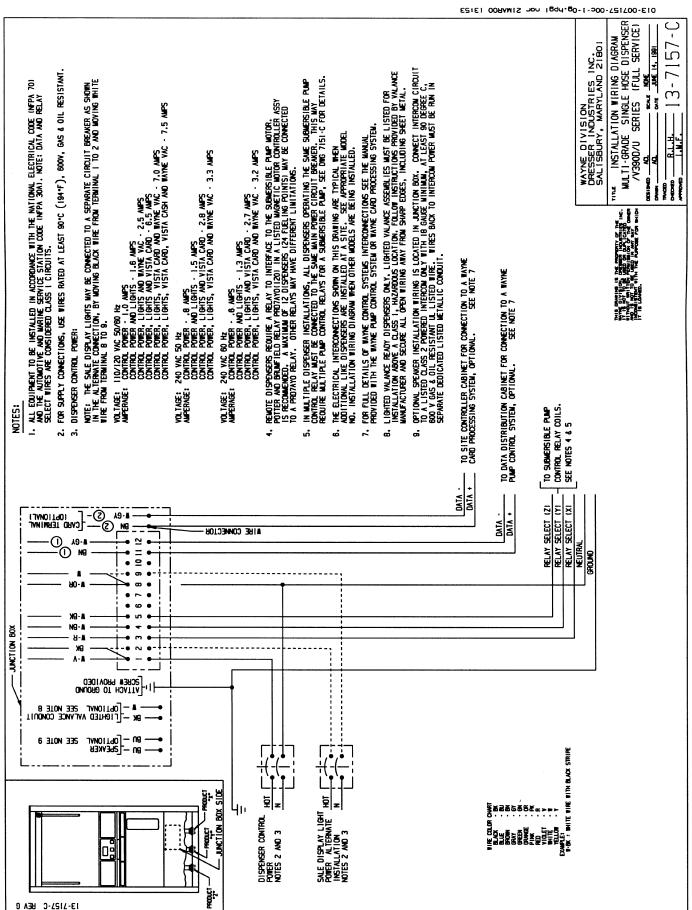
13-7157-C Installation Wiring - 4/V390D/U (Remote)
